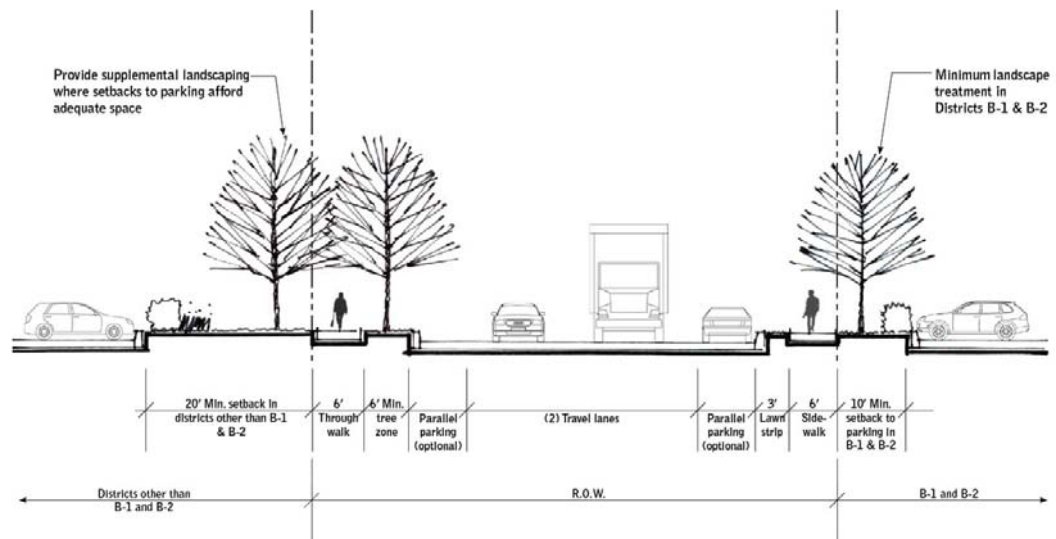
I: Parking Setback from Public Street R.O.W. (Connector Streets) The above sketch illustrates parking setbacks along public streets. The right side shows minimum setbacks for B-1 and B-2 districts and the left side shows minimum setbacks for districts other than B-1 and B-2, including the TNC District. The section also shows required minimum sidewalk and landscape treatments.
